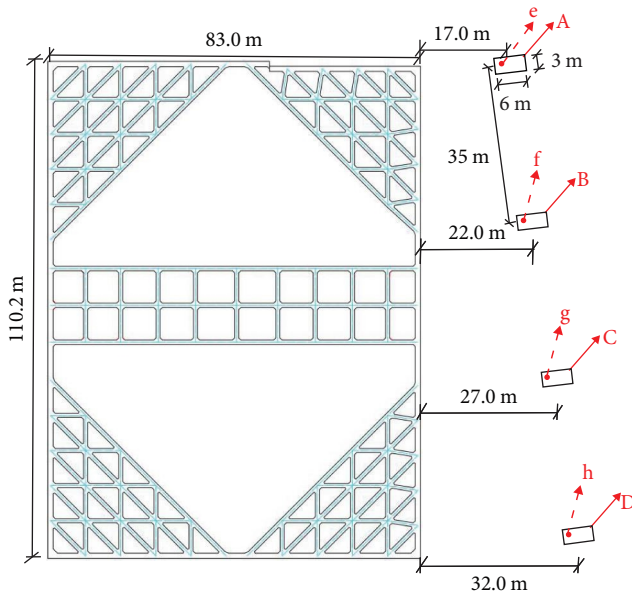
Floor plan of the foundation pit and viaduct bearing of the production and living complex building.
